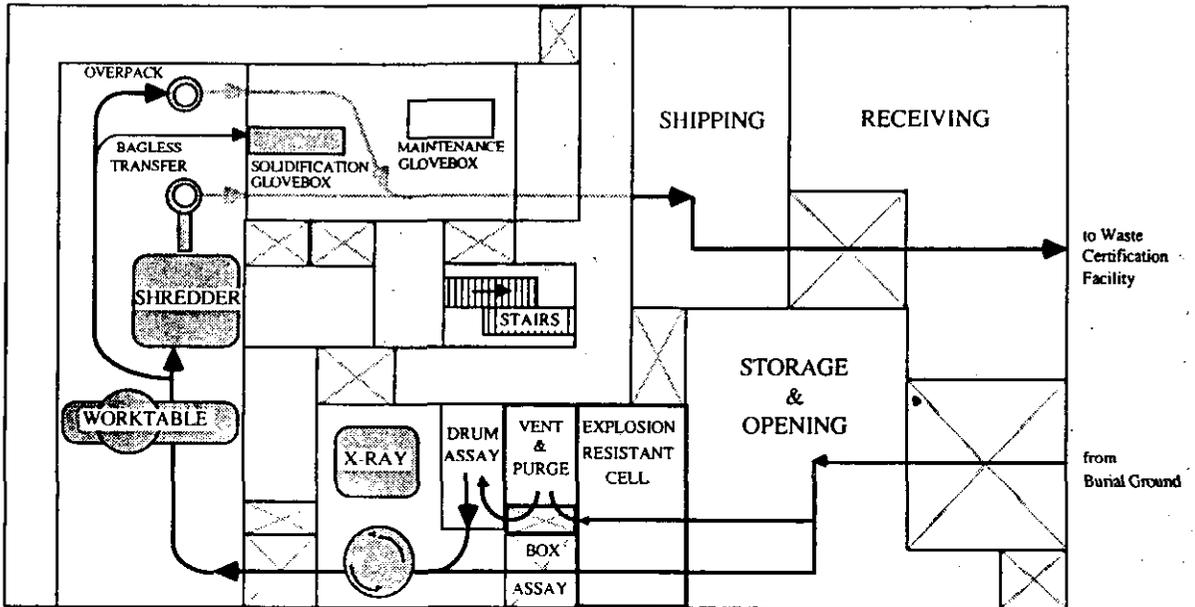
Transuranic Waste Facility Conceptual Floorplan
